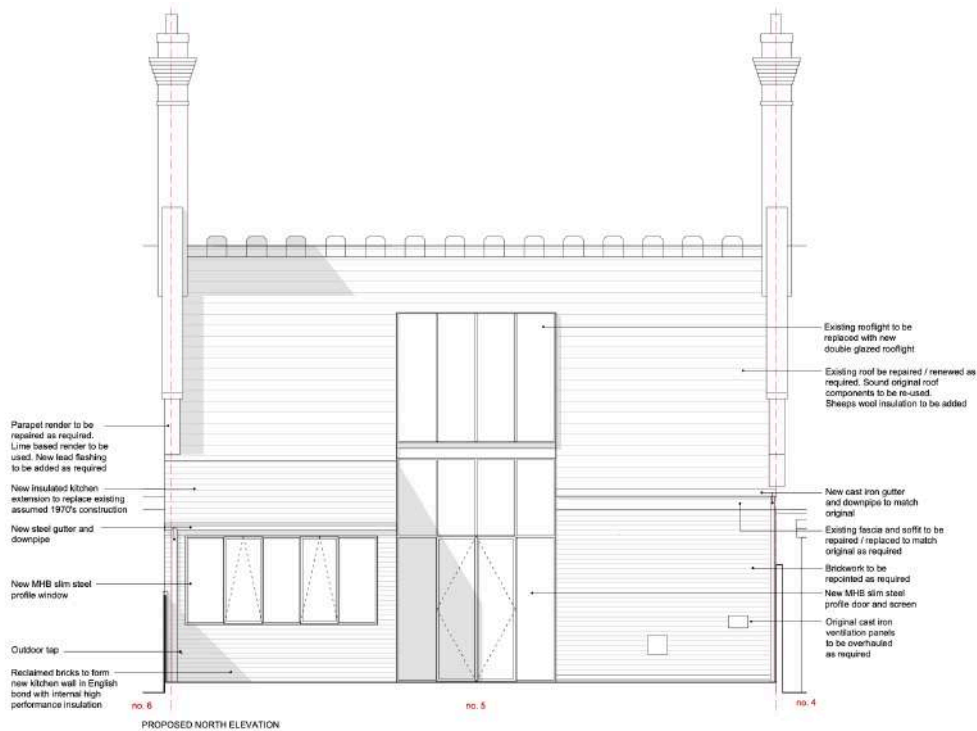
Primrose Hill Studios, approved drawing (2022/3472/P) showing double glazed thermally broken “MHB slim steel profile” rooflight, doors and windows
